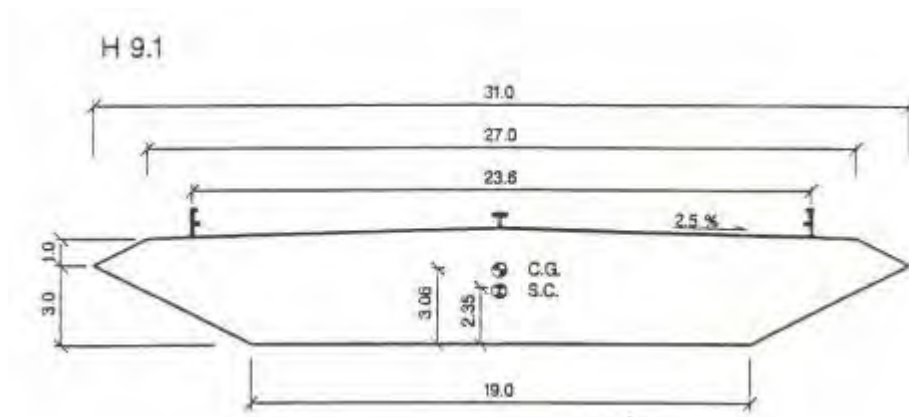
H9.1 deck section, suspension bridge, Storebælt East Bridge.
